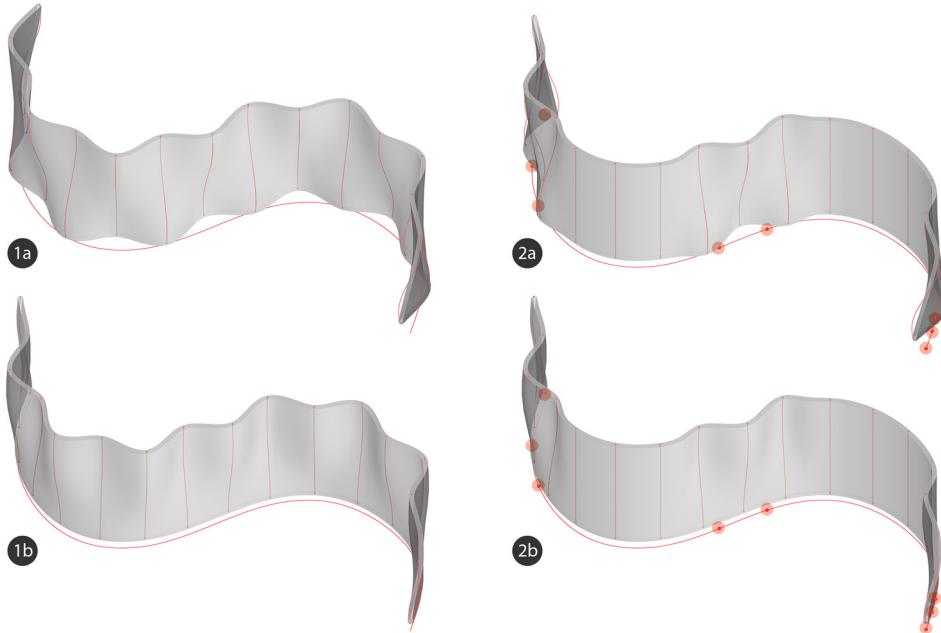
Side view showing the construction-specific constraints in relation to the wall height and foundation.
